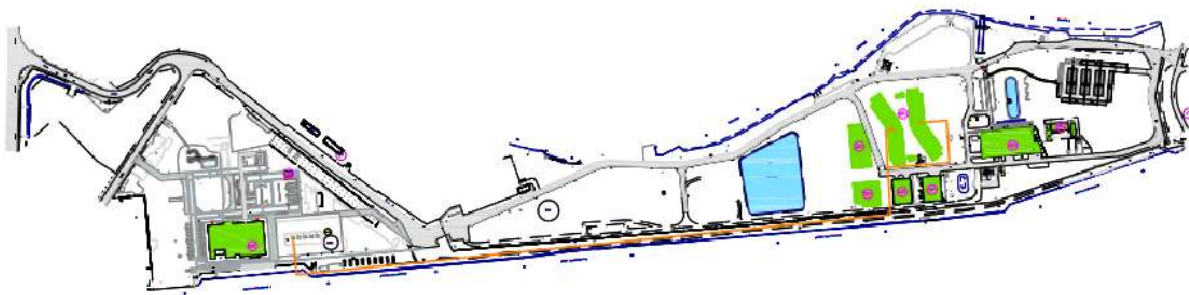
Proposed network trace from the 3rd well of the Balmatt site to the Earth buildings (network trace is marked in orange).
